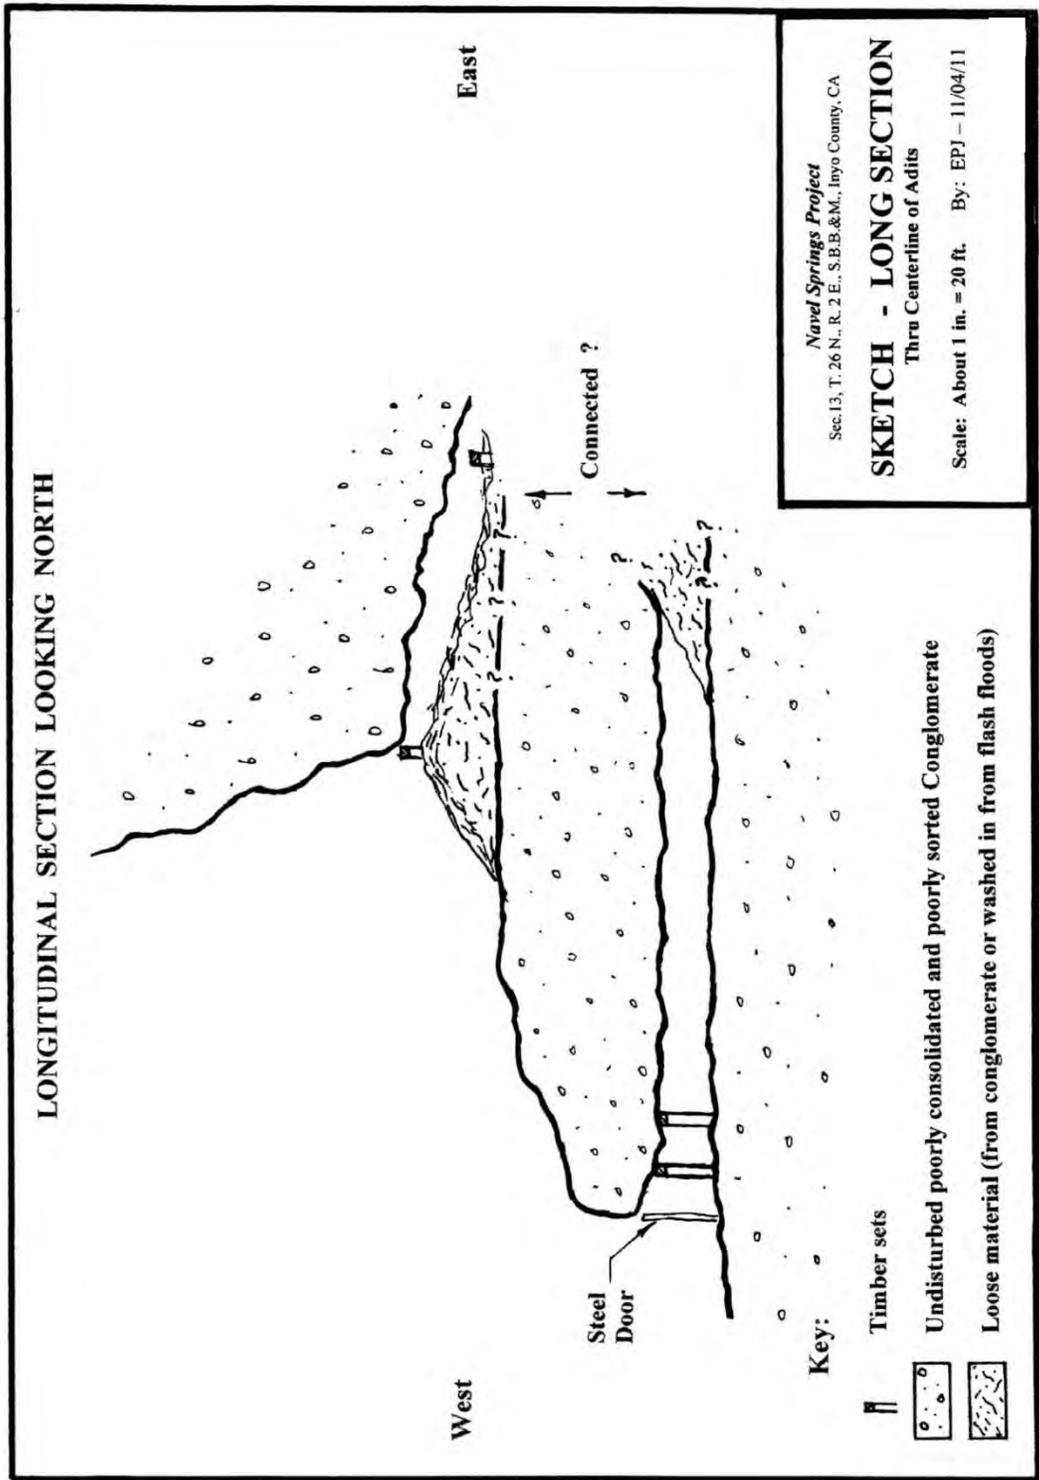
Longitudinal section of the Navel Spring water collection adits.
